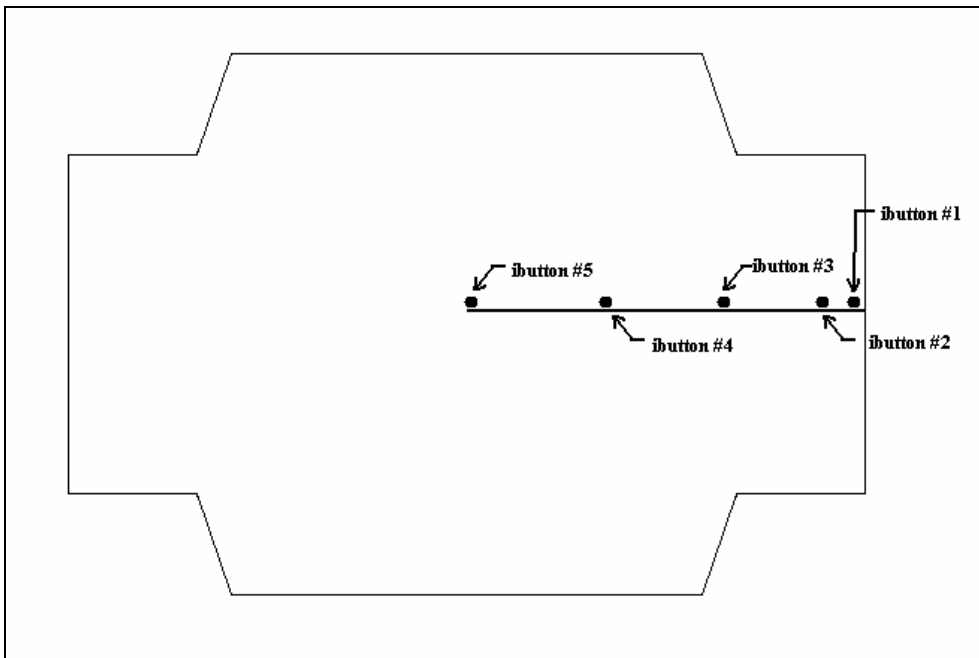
Plan view of column showing iButton run #4 layout (not to scale)
